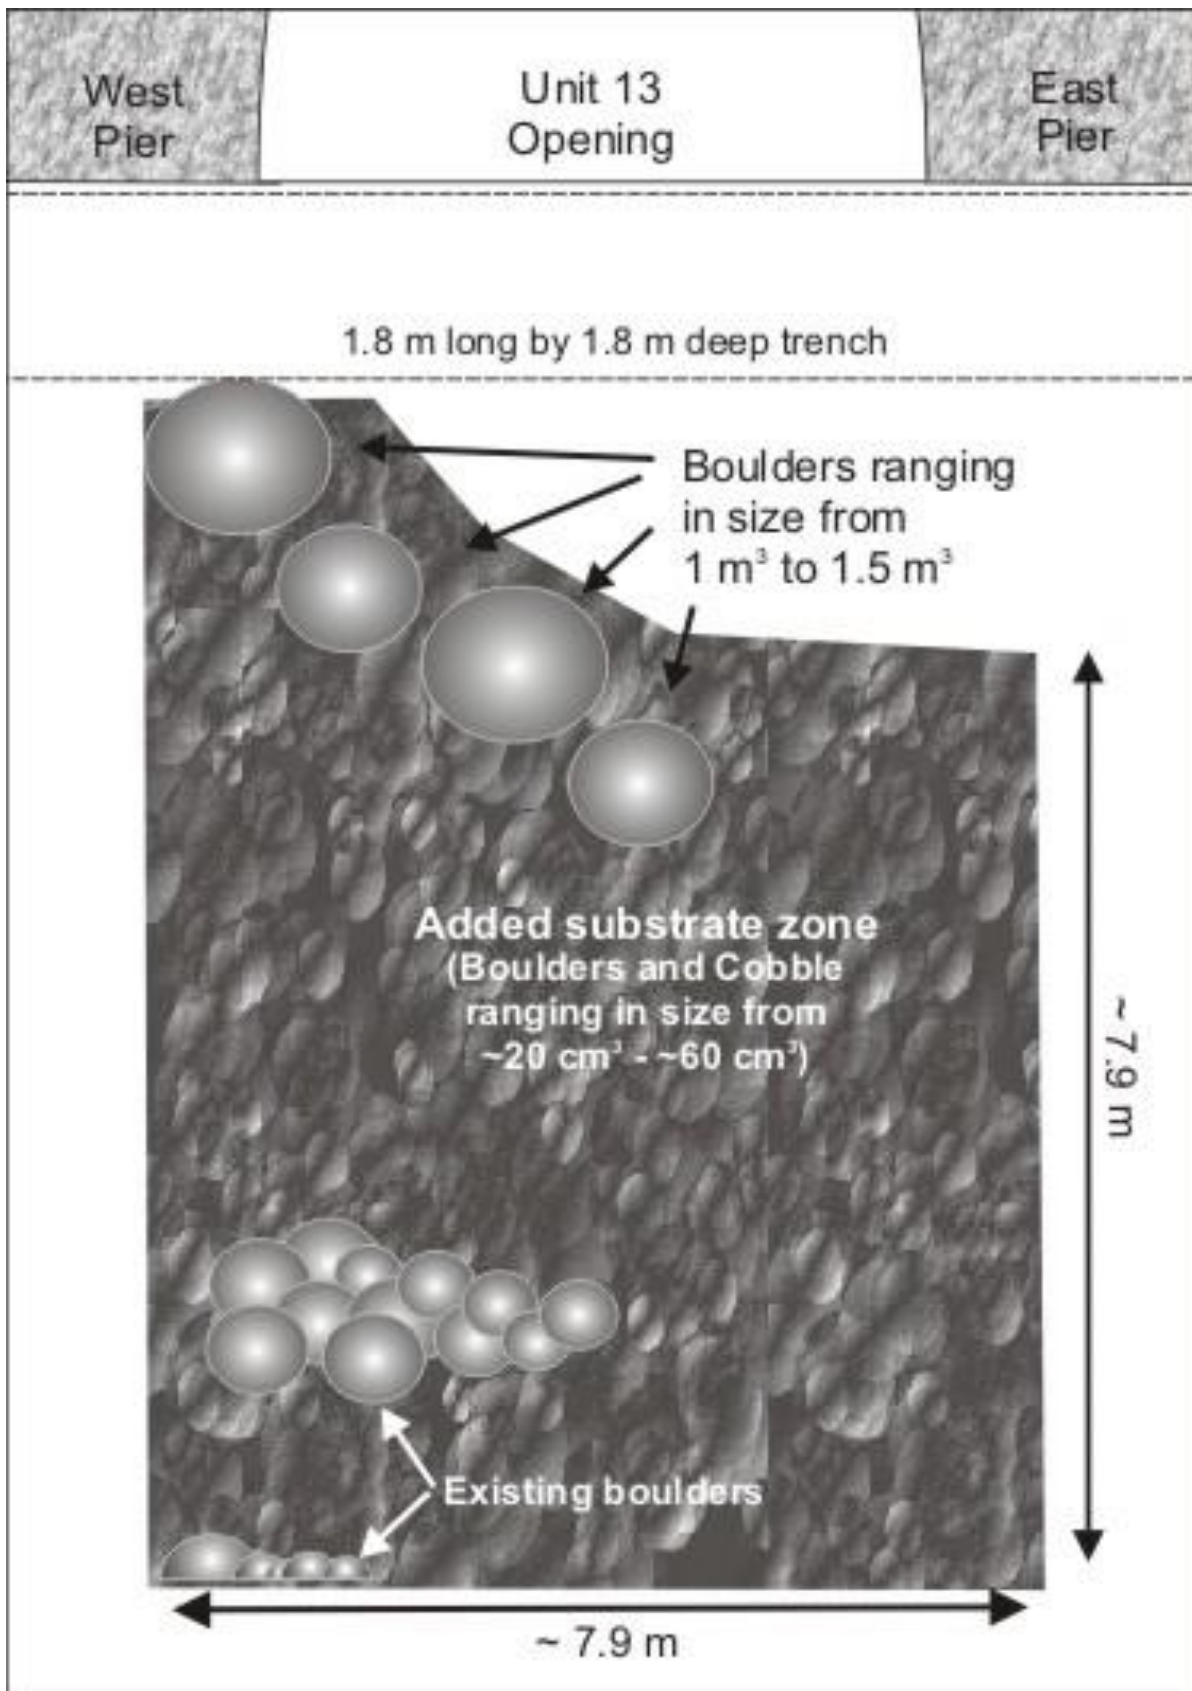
Plan view sketch of shoal constructed below Unit 13 (not to scale).
